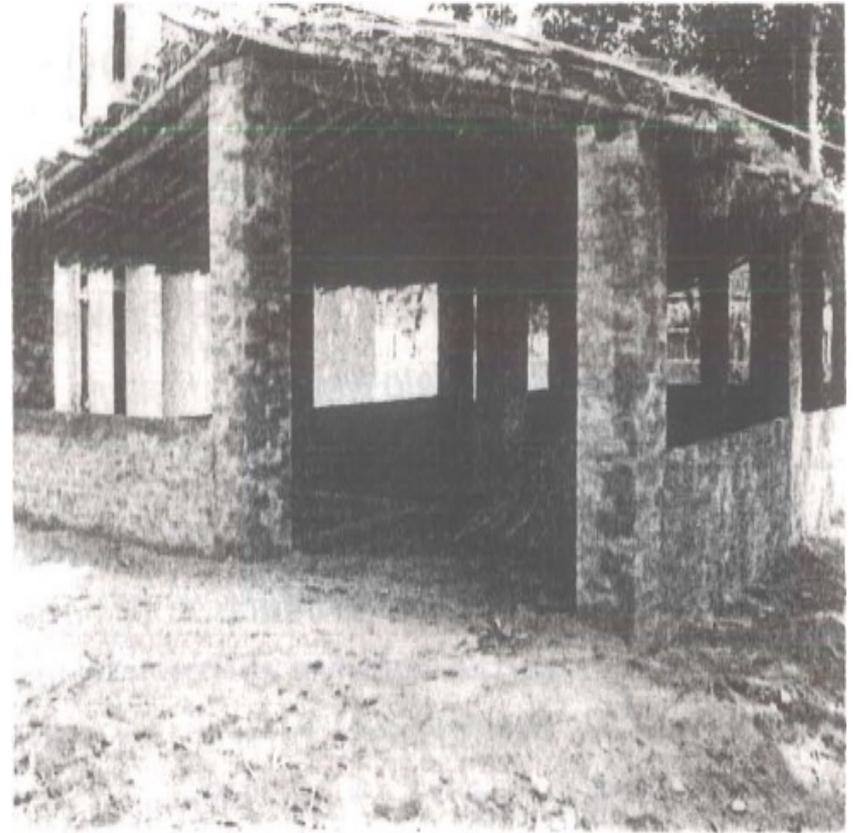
Thatched roof at storage site for providing additional protection against hot sun and rains.
